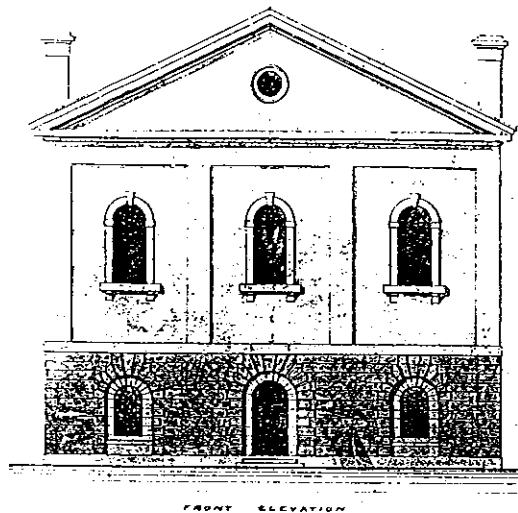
Front elevation, chapel wing, B Division (the Panopticon). Office of Building microfilm no. PGP 1.89.
